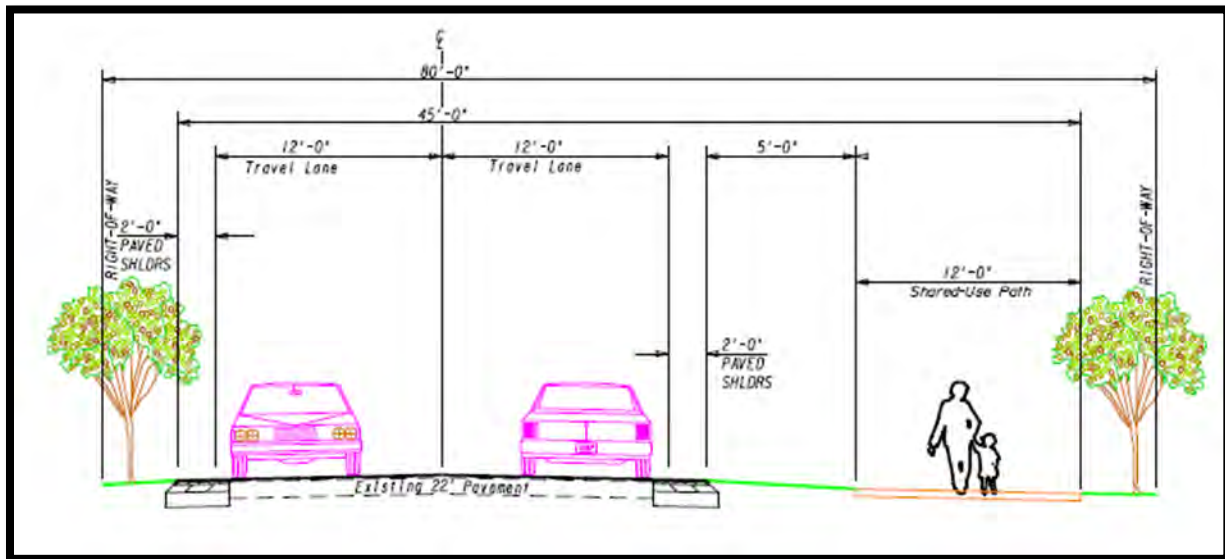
Proposed Typical Section – Alternative 1 & 2 – 20th Ave. to Entrance 1 & 2
